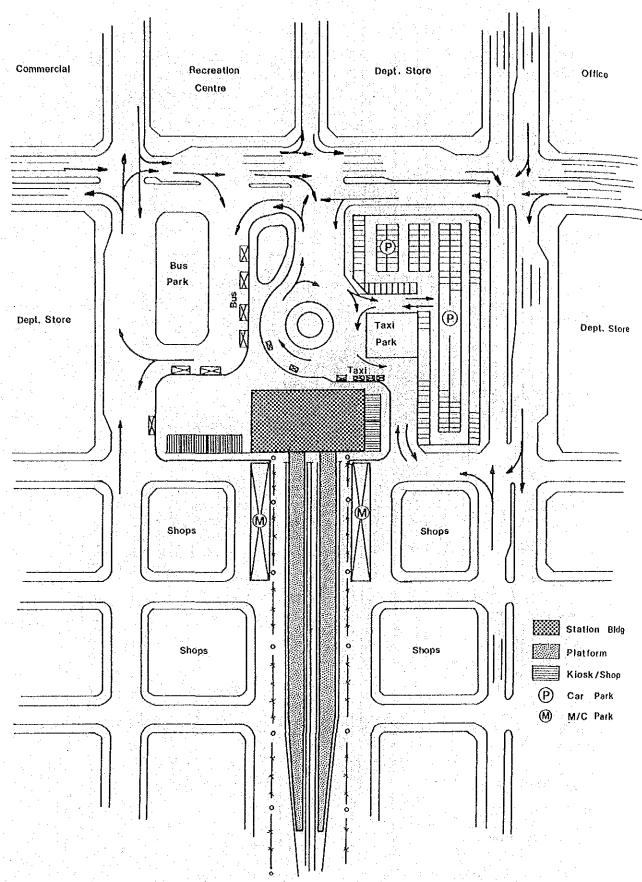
Typical Layout Plan For Station Plaza At Terminal MRT Station
